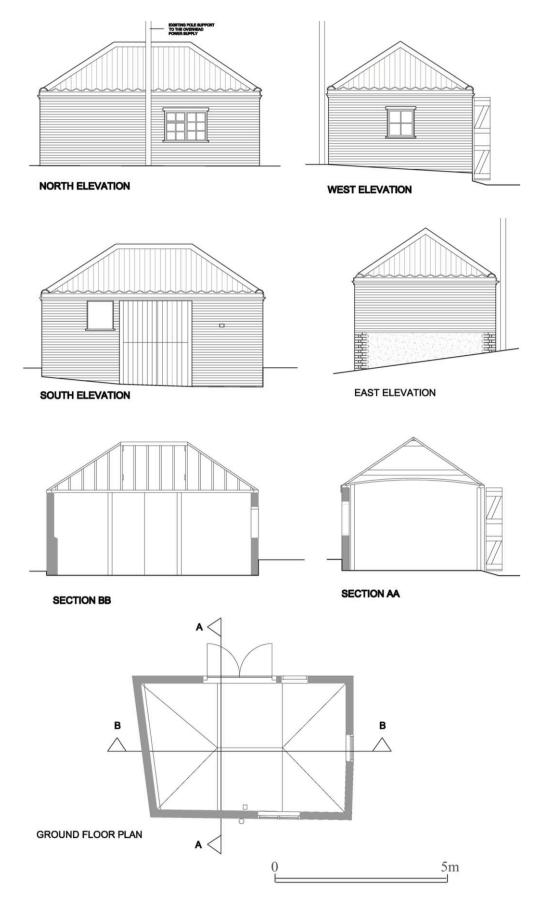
Elevations and plan of the workshop (5). The plan shows north towards the bottom left-hand corner
